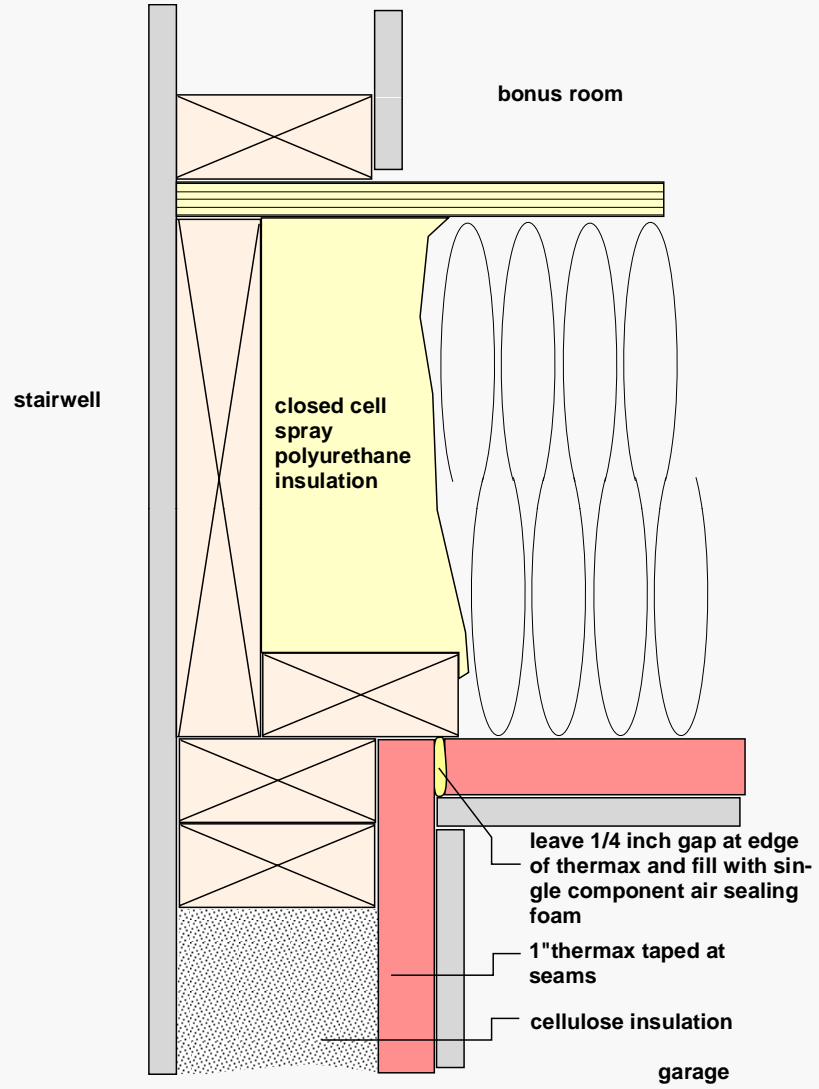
Intersection of stairwell/garage wall, bonus room wall and floor between bonus room and garage
